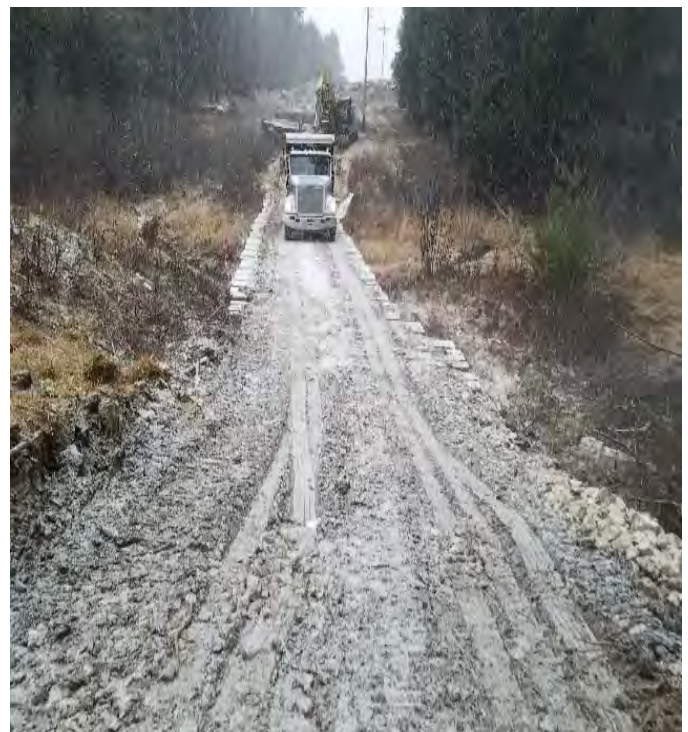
Building access road from Str. 50 to 58. Viewing northeast. (12-17-19).
